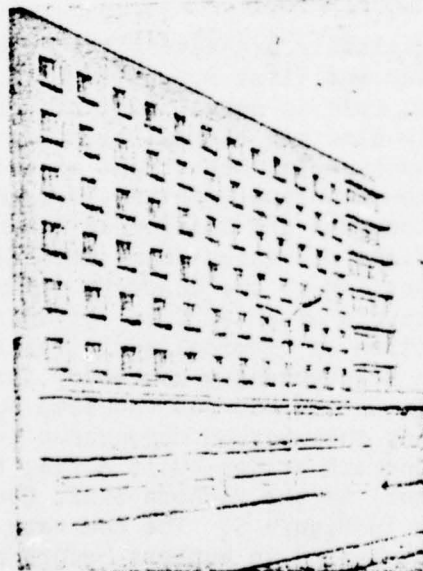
"Lena" Hotel Building Built in 1972/73 in Yakutsk on Permafrost Ground. Electrical heating of the concrete was used in erecting the grating on a pile arrangement and supporting structures.
